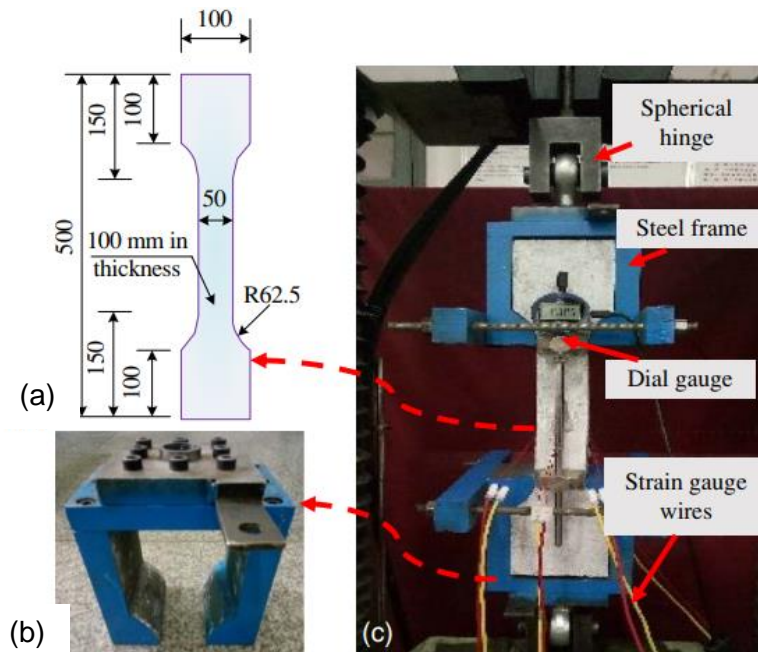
Method VI test setup (Qiu et al., 2022) (a) specimen dimensions (mm), (b) special steel frame, and (c) Method-VI specimen assembly in testing machine
